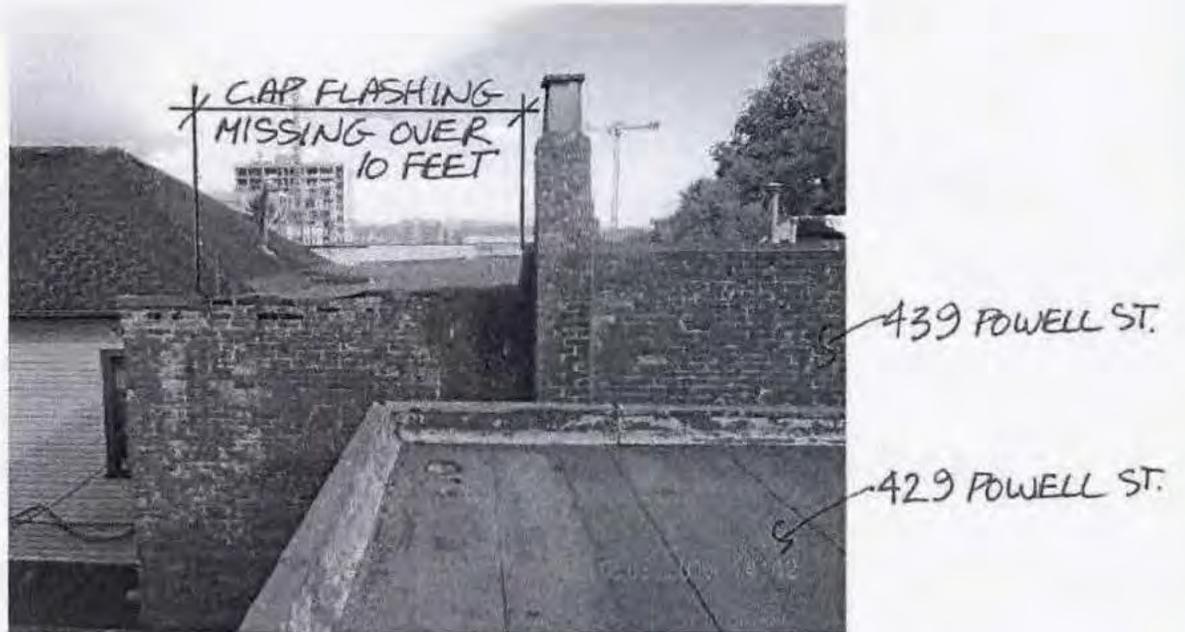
Cap Flashing Missing on West Elevation of 439 Powell Street, Vancouver
